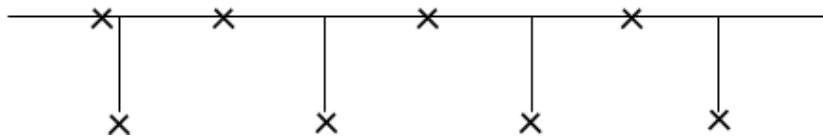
Flexural crack initiated at first, second, third and fourth span and bottom of all piers at PGA = 0.31g
